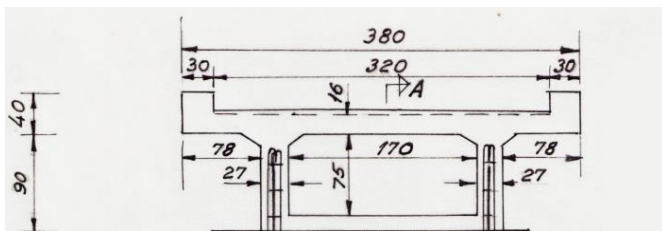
Bridge cross-section at pier. Hollow box girder. Measurements in cm. From the ICRA's drawing set.
